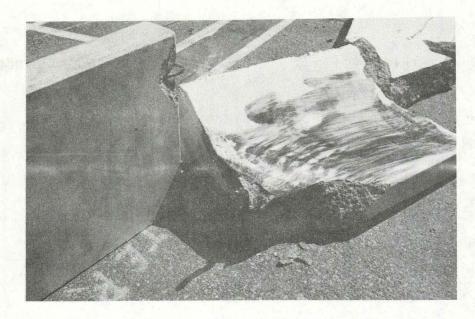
TEMPORARY CONCRETE BARRIER RAIL DAMAGE
